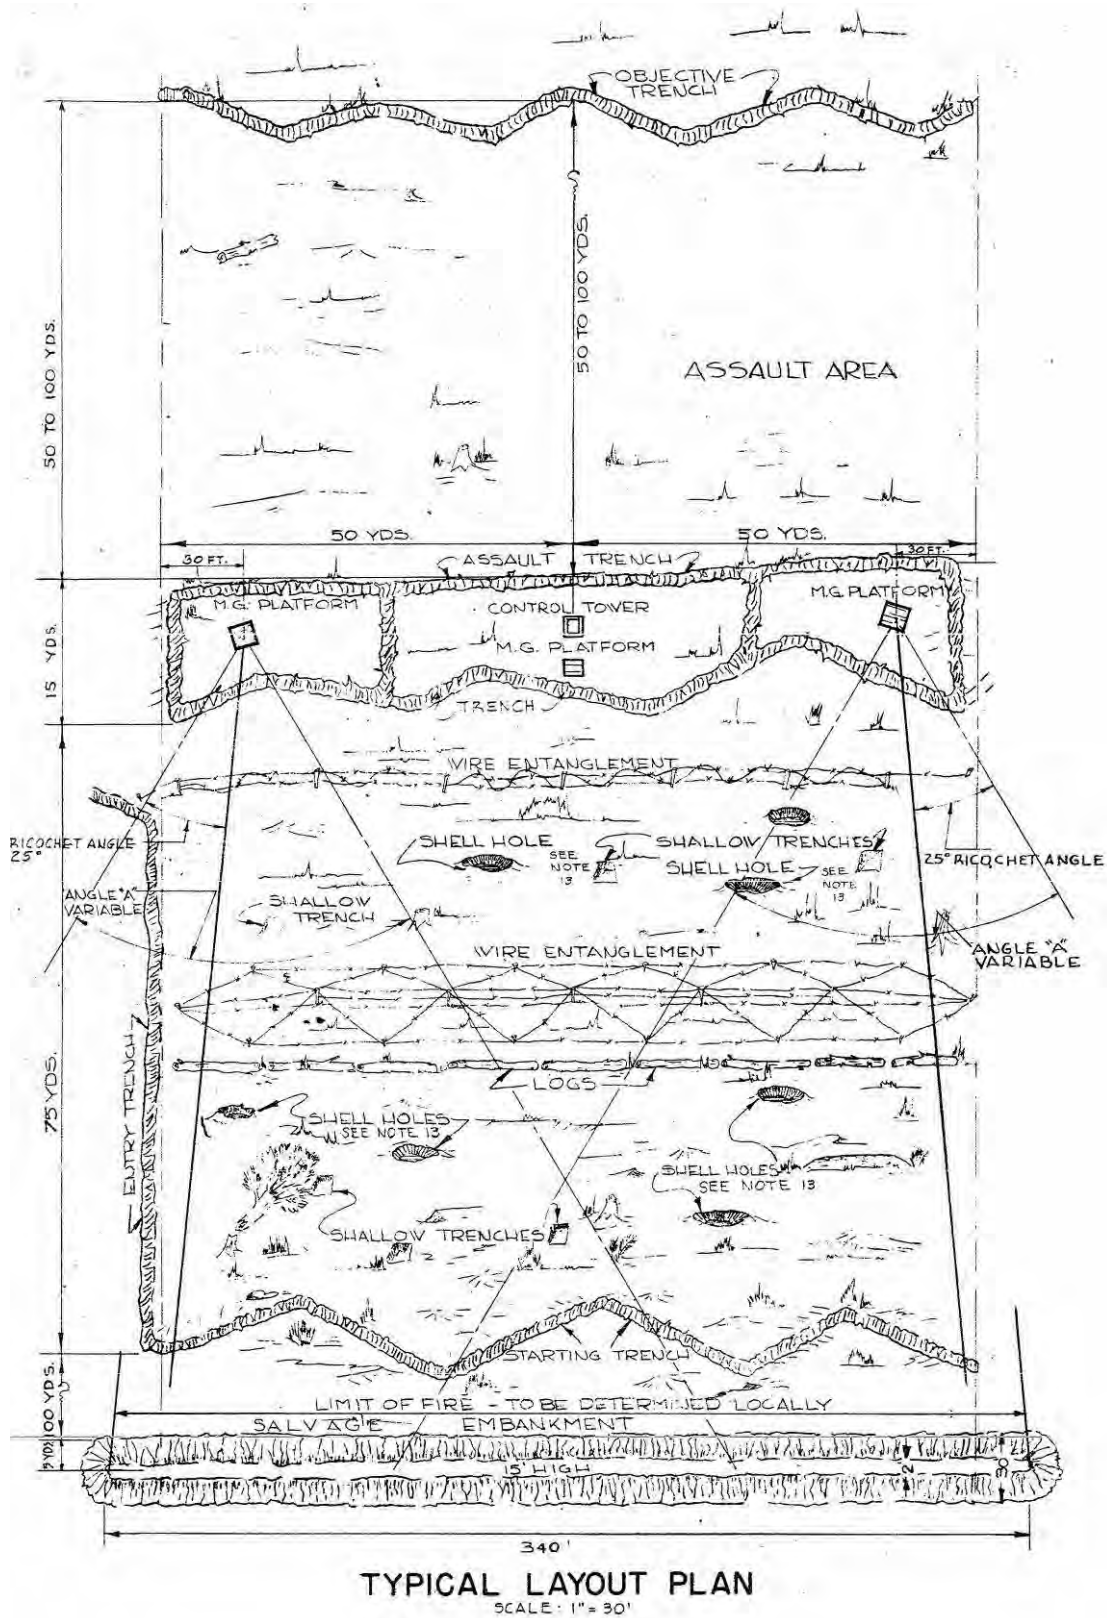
Infiltration course, typical layout plan, Fort Bragg, NC, 1951 (standard drawing 28-13-34 sheet 1 of 1; infiltration course, typical layout and details; 21 November 1951).
